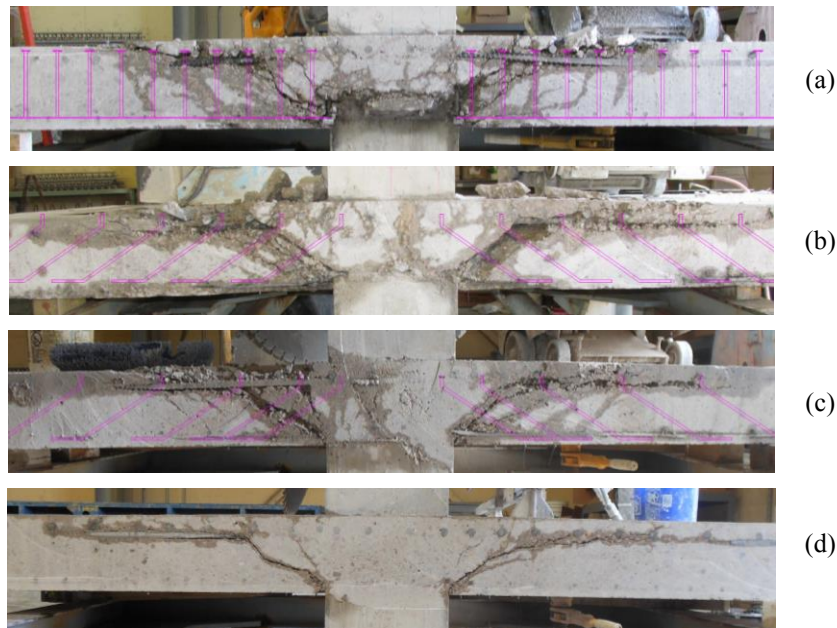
Cross Section of the Failure Modes (partial cross section shown); (a) Slab 1, (b) Slab 2, (c) Slab 3, (d) Slab 4
